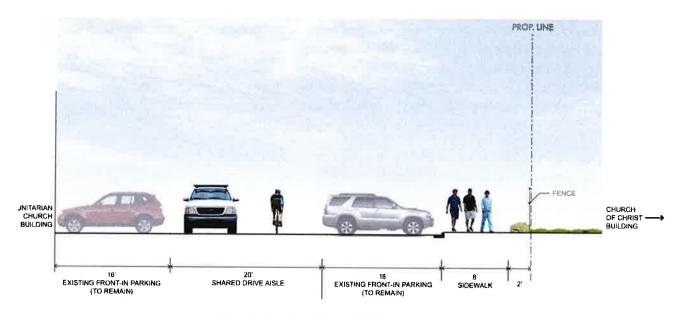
Option 1 – Minimal Build-Out Typical Section
